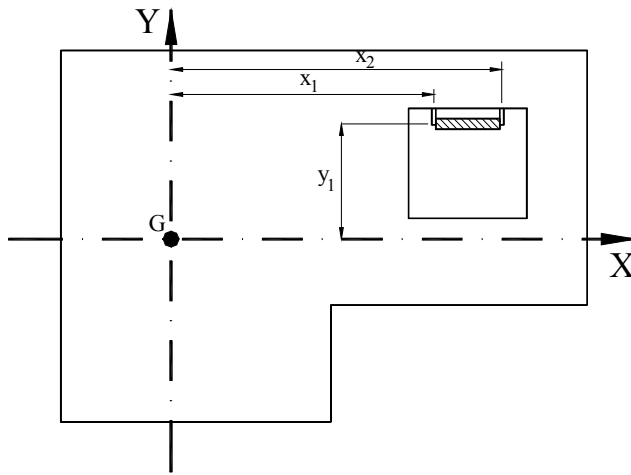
Location of the elevator hoistway on a typical floor plan.
